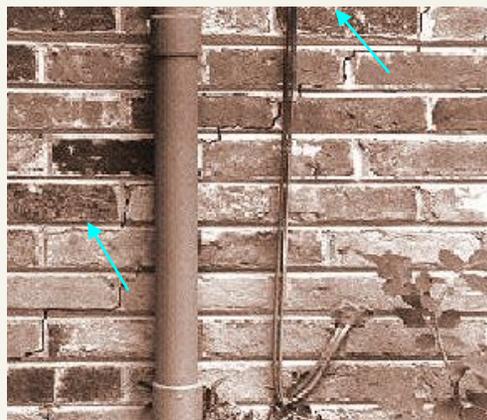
Example of a common wall crack which follows the brick in a stair-step pattern. This type of movement was probably caused by thermal or moisture expansion.
